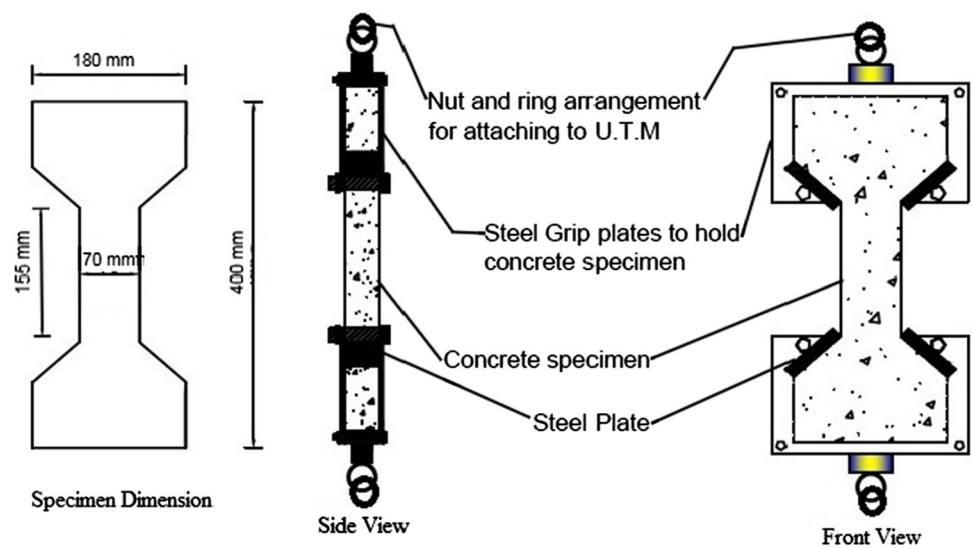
Schematic diagram of concrete specimen and grip details of direct tensile test
